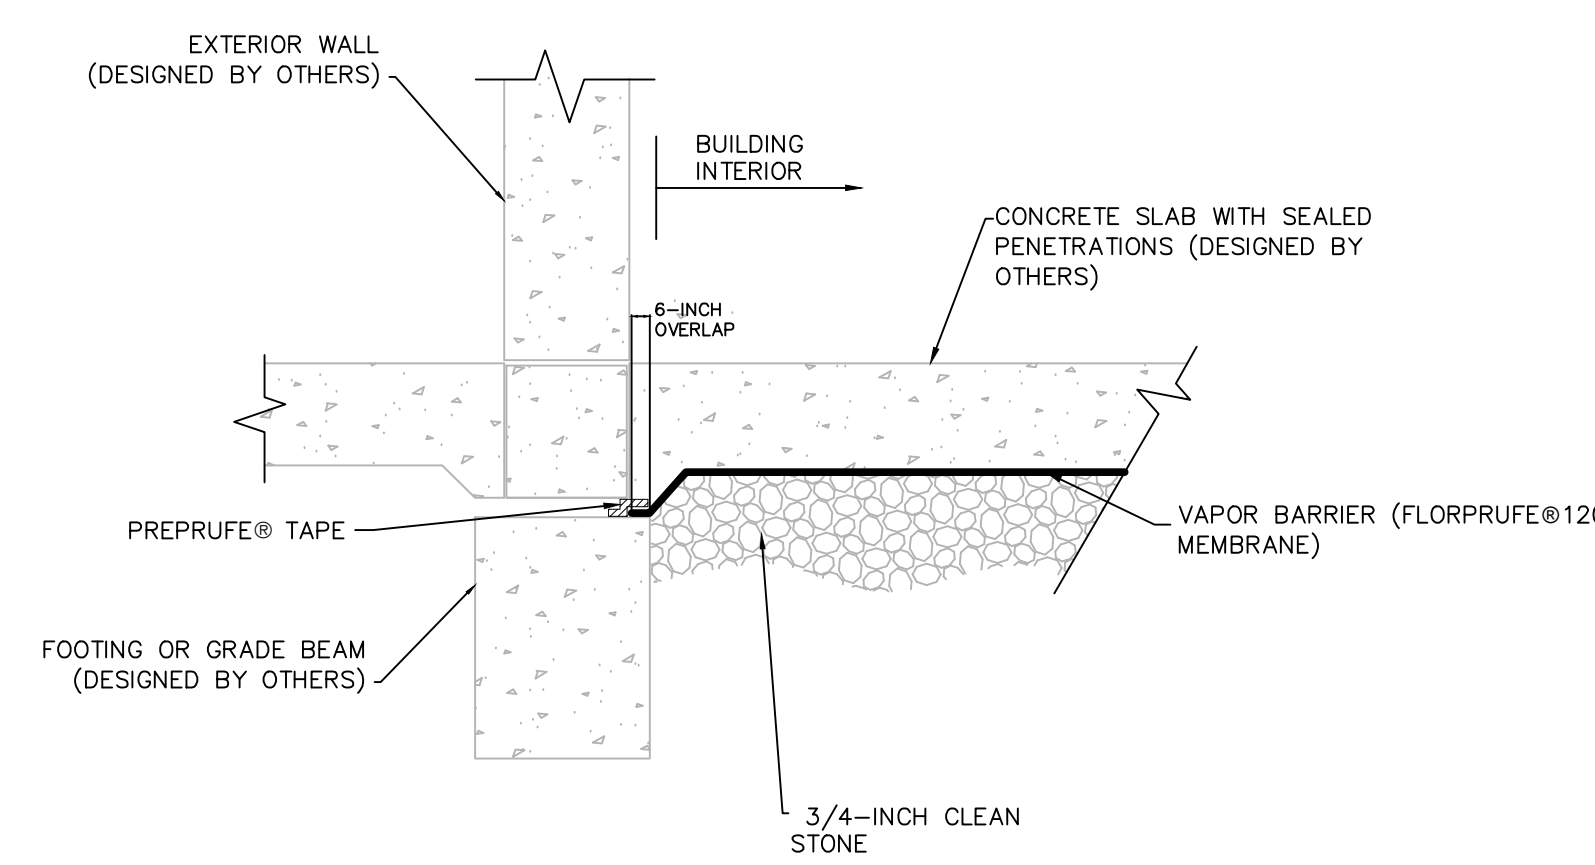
TYPICAL VAPOR BARRIER ASSEMBLY AT INSIDE CORNER
